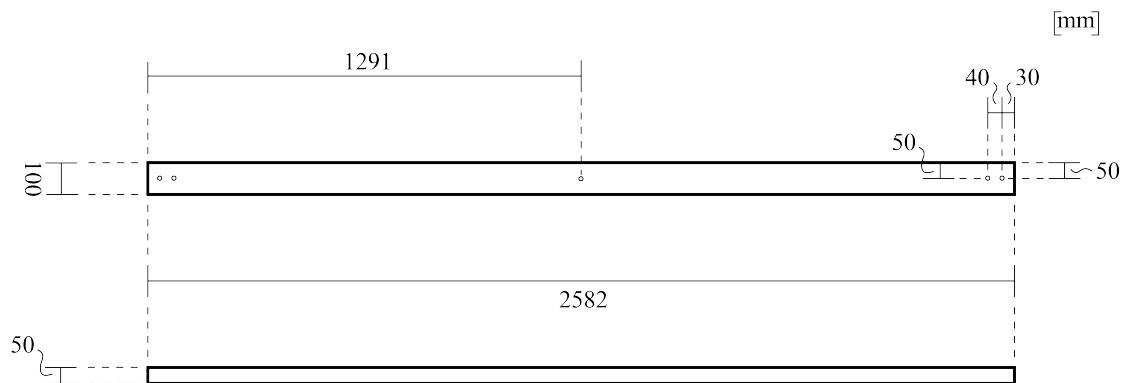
Drawing of an outer diagonal in a module with measurements assuming that M16 bolts are used.
